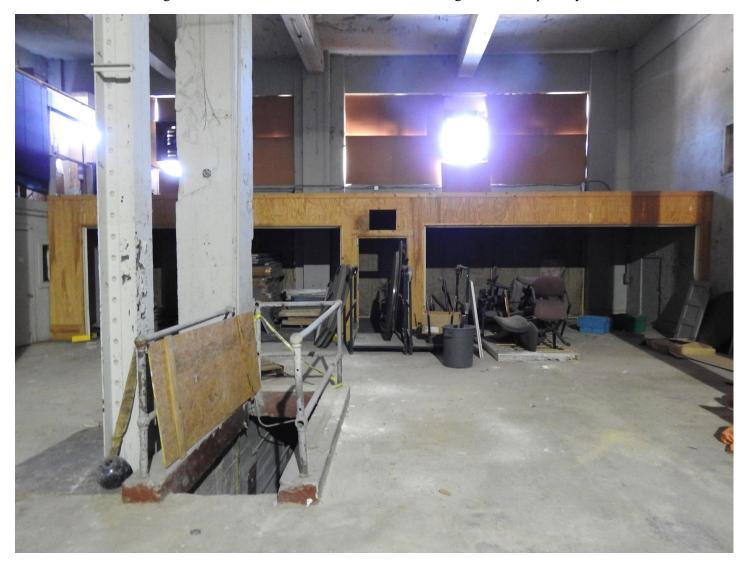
First floor hardening/freezing room (modified) with portions of original tile walls visible at base of existing
